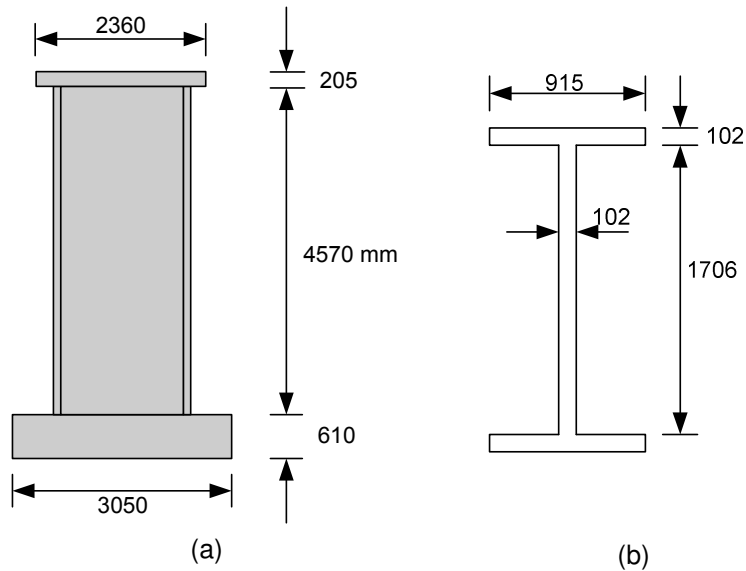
Details of Wall F2: (a) dimensional details; (b) sectional details.
